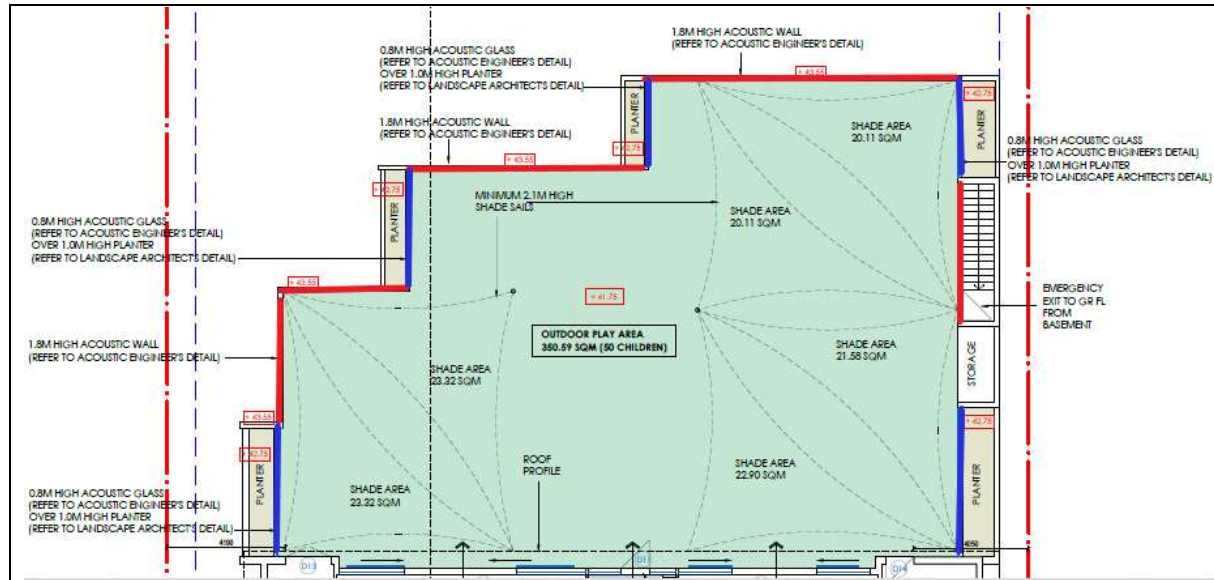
External Walls or Barriers – Level 1 Outdoor Play Area
